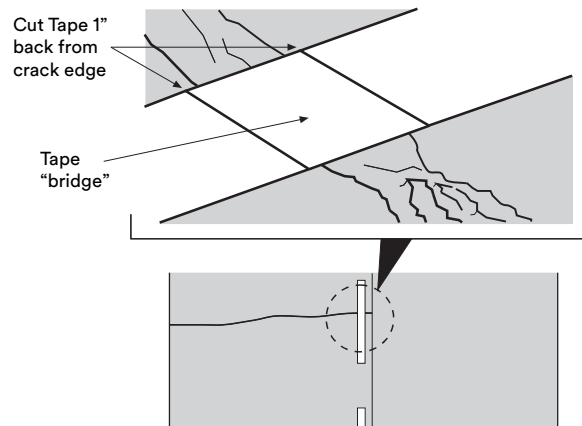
Where to cut Tape when installing over pavement crack or bridge expansion joint.
